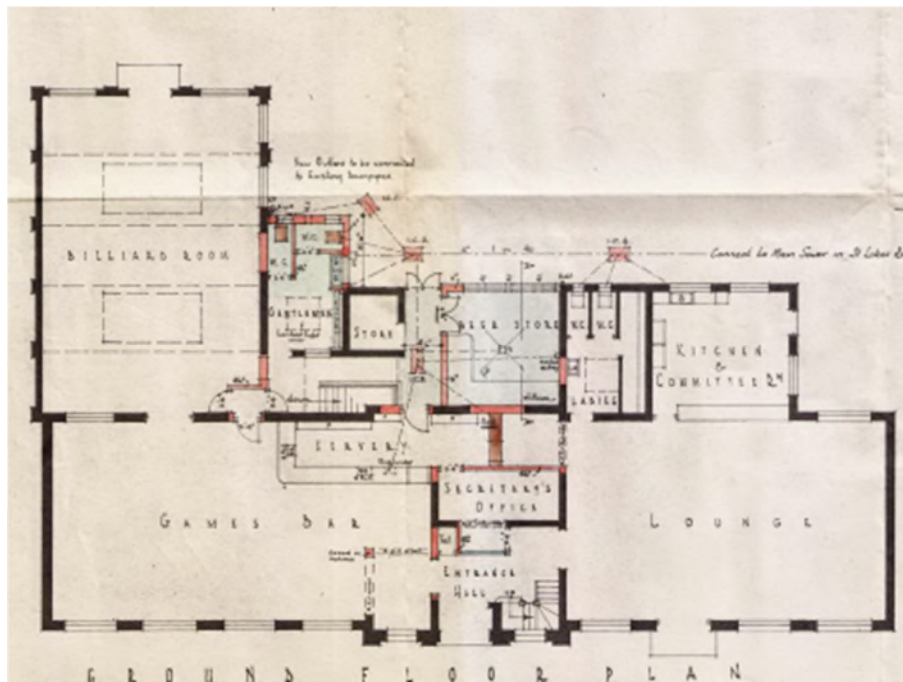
Ground floor plan of Cowley Conservative Club (1952)
